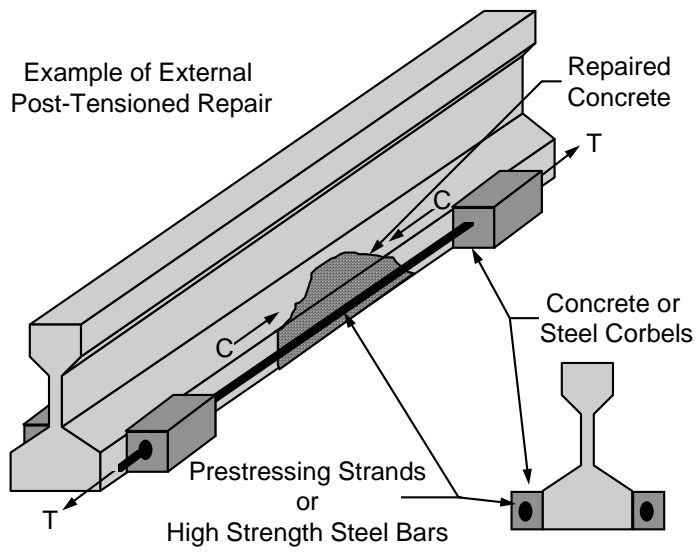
Repair of impact-damaged prestressed girder by external post-tensioning
